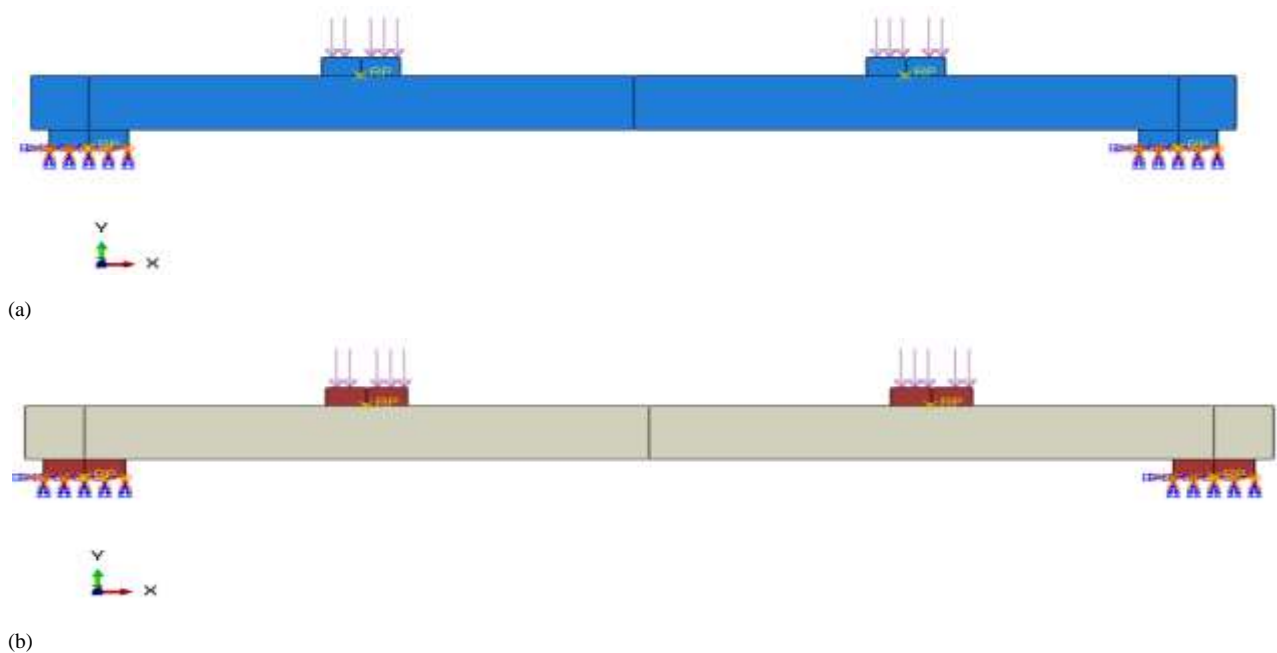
Model diagram of (a) reinforced concrete beam, (b) precast concrete beam
